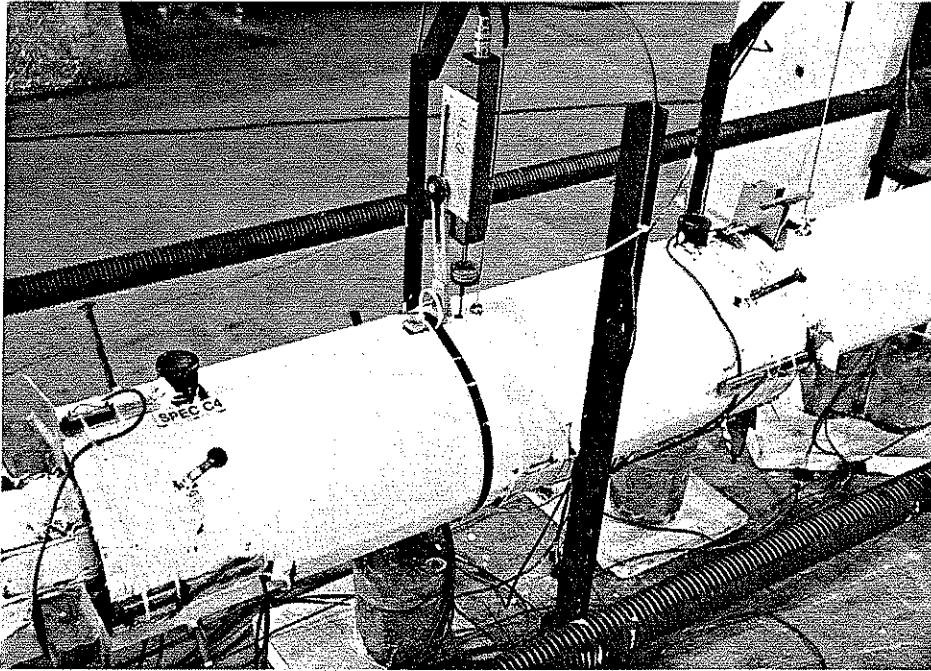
Instrumentation of grouted sleeve on Specimen C4.
